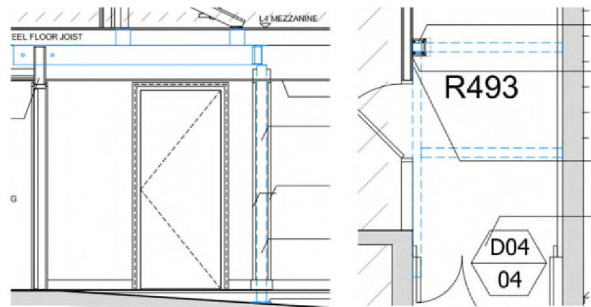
and 5b – Installation of new steel beams and post, shown in blue (Extracts from drawing ref. 3147-P7-2405)
